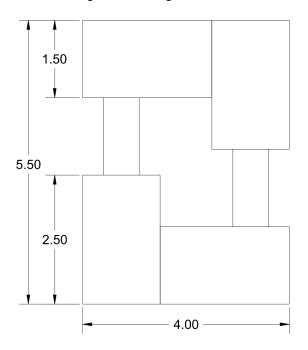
5.5" BareNaked Tstud™ Built-Up Column
